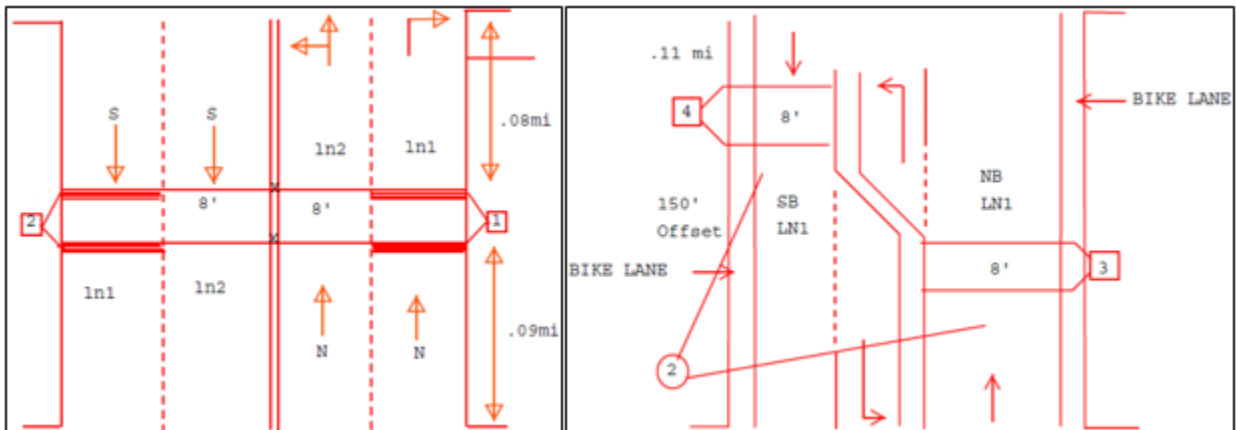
Schematics of Colts Neck Road Site 2 Data Collection Locations Before (Left) and After (Right) Road Diet. Images provided by The Traffic Group, Inc. Reprinted with permission.
